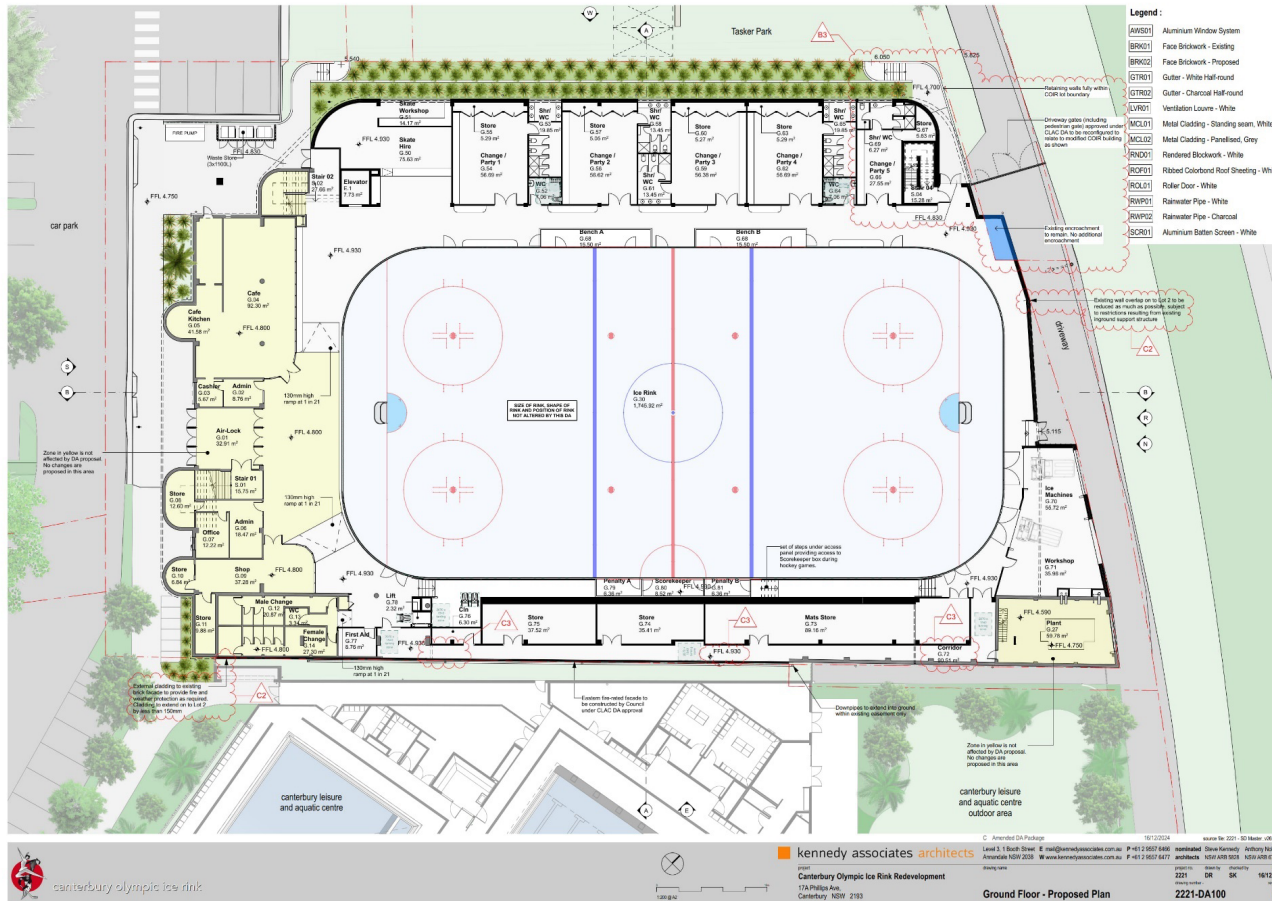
Ground Floor - Proposed Plan (Source: Kennedy Associates Architects 2024 2221-DA100 Rev C)
